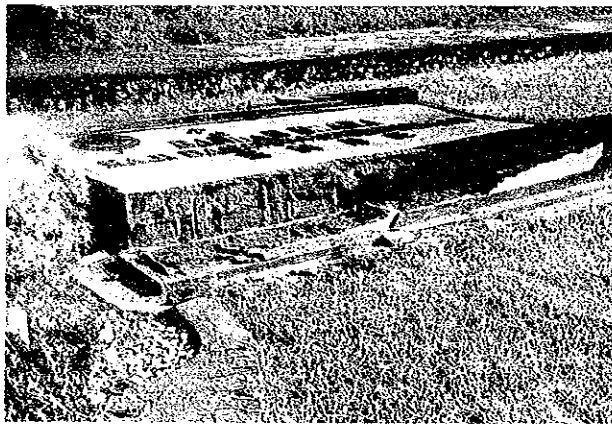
Airport Name Wall Panel, Falling Down, No Reinforcing
